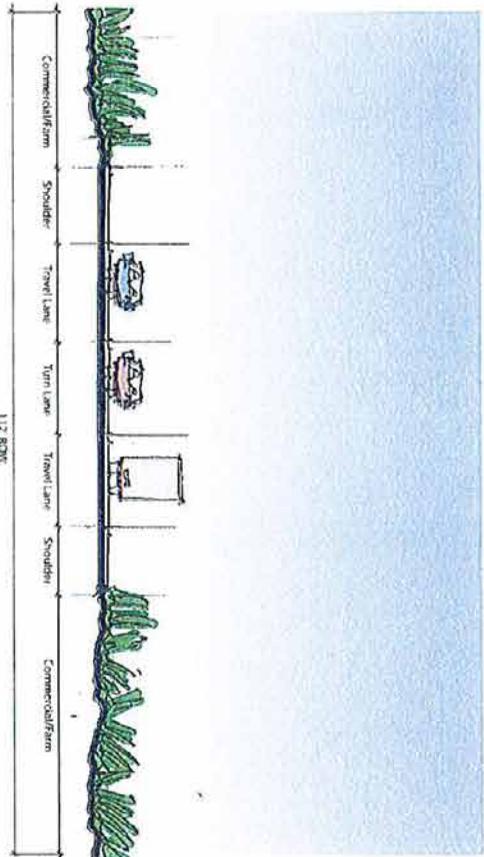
CROSS SECTION OF EXISTING CORRIDOR
